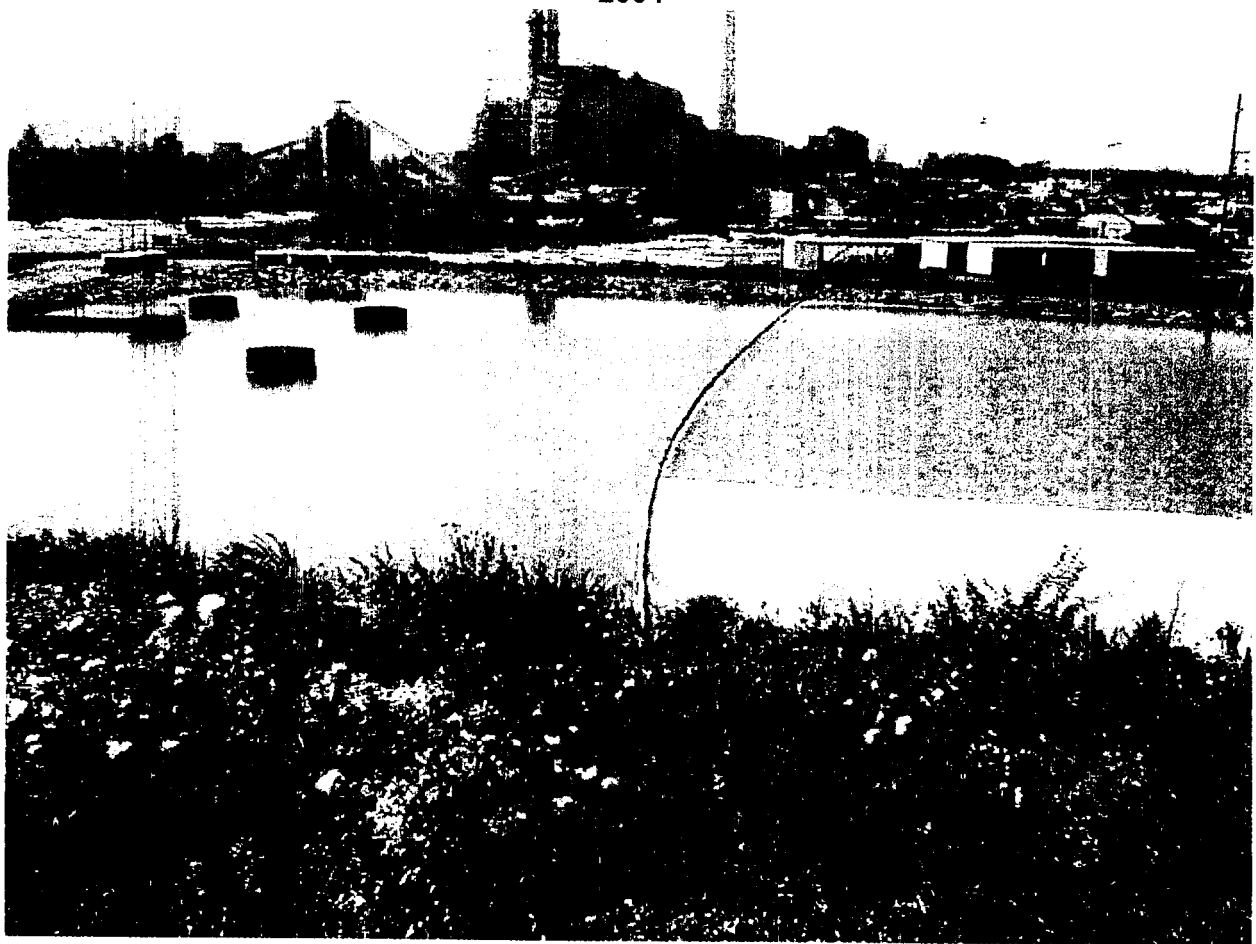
Active Ash Disposal Area – Standard spillways with skimmers in Stilling Pool Area.
